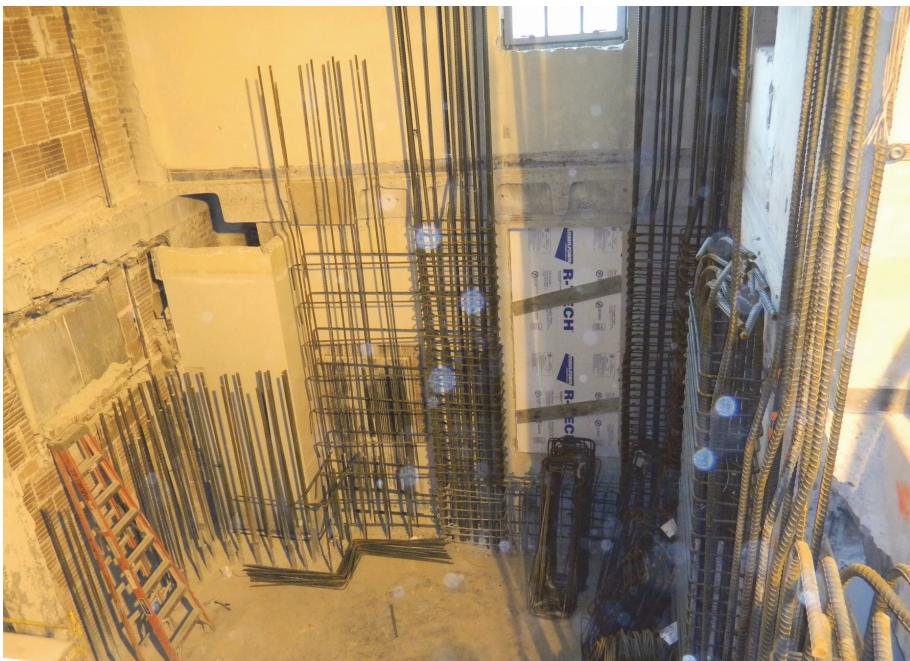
Steel reinforcement placed during the retrofit of Ogden High School (photo credit: Reaveley Engineers).
